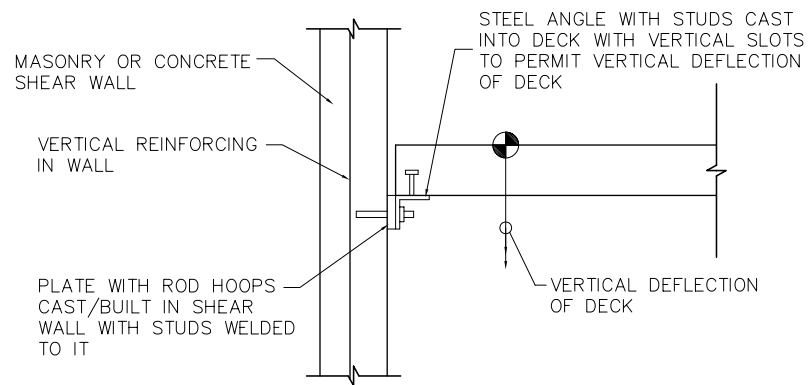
Problems with Utilizing Stairwells for Lateral Bracing
